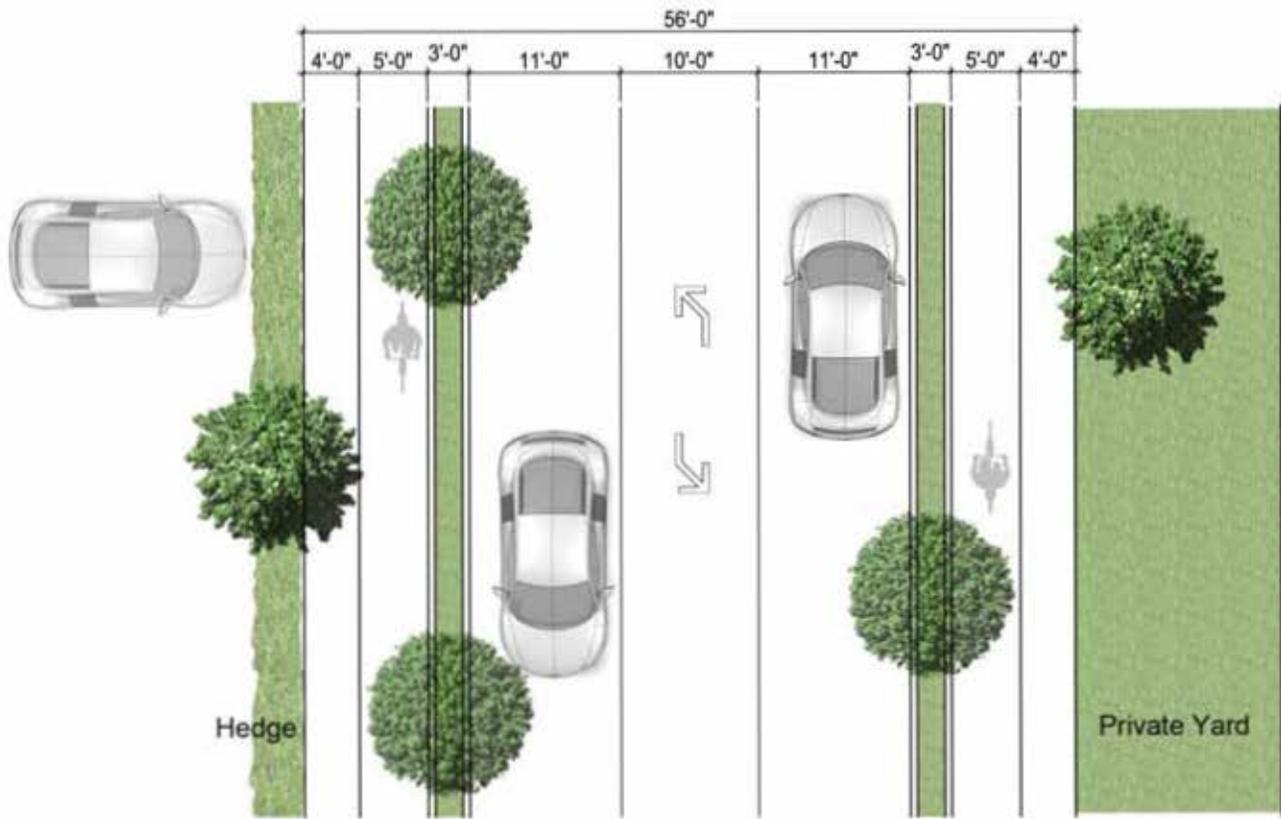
Street Plan and Section - Hallock Ave. with bike lanes
